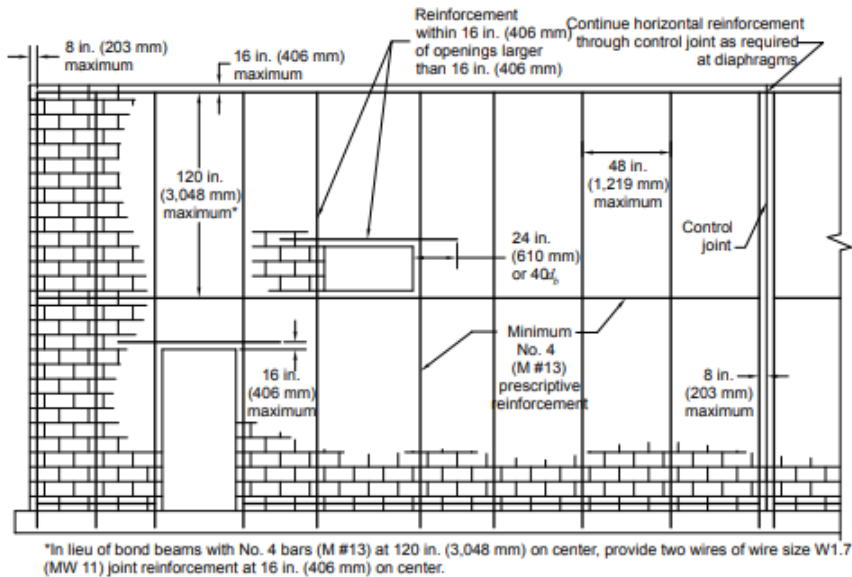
Prescriptive Seismic Detailing for Intermediate Reinforced Masonry Shear Walls
